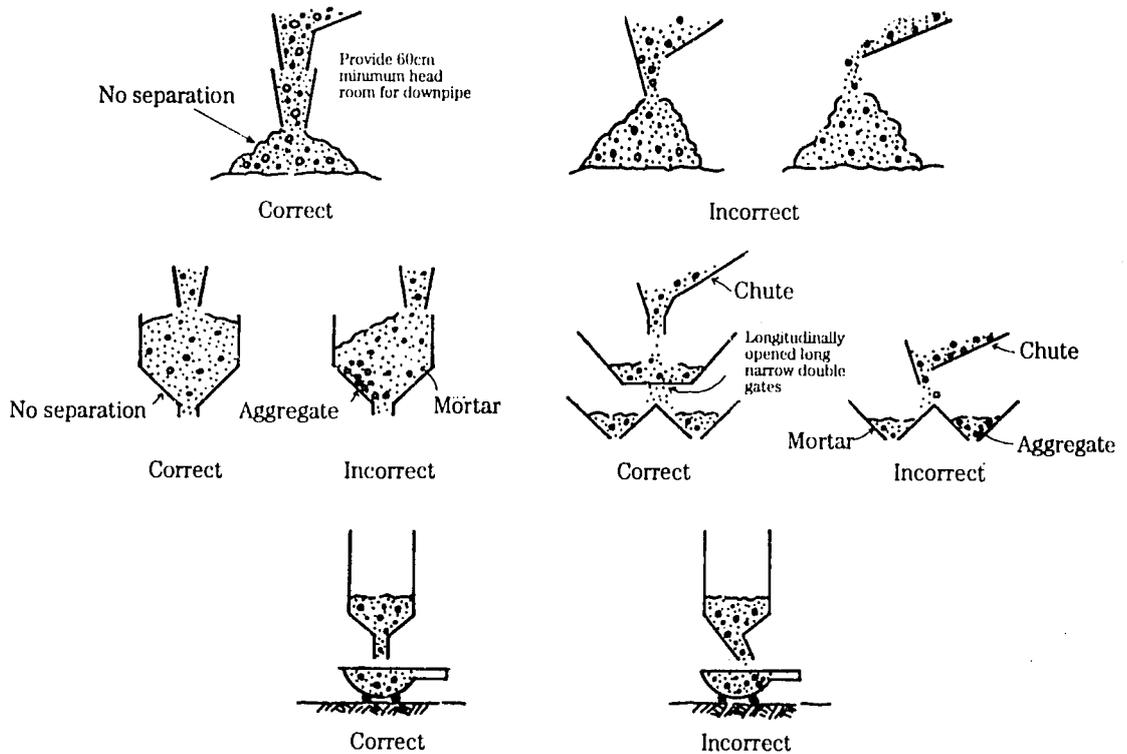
Schematic diagram for concrete packing (Concrete Manual, U.S.B.R.)
